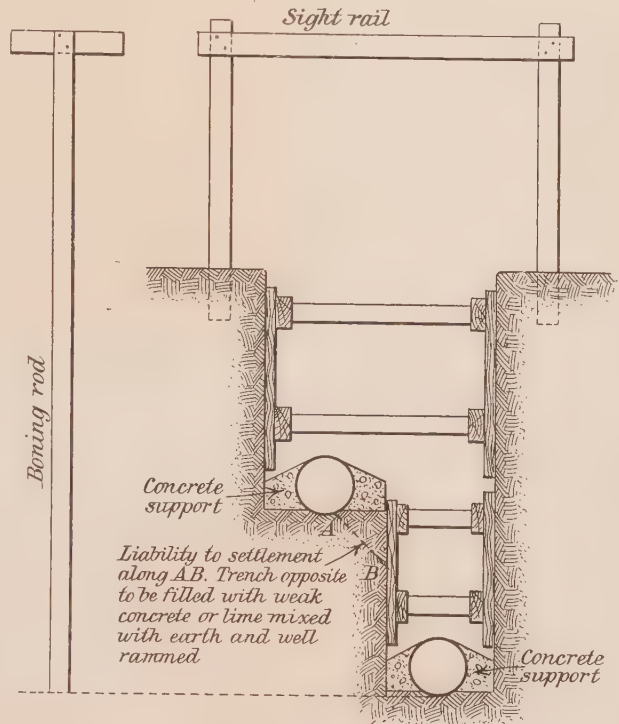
Section of Trench for Sewer and Storm-water Drain, showing Concrete Support to Pipes, etc.
